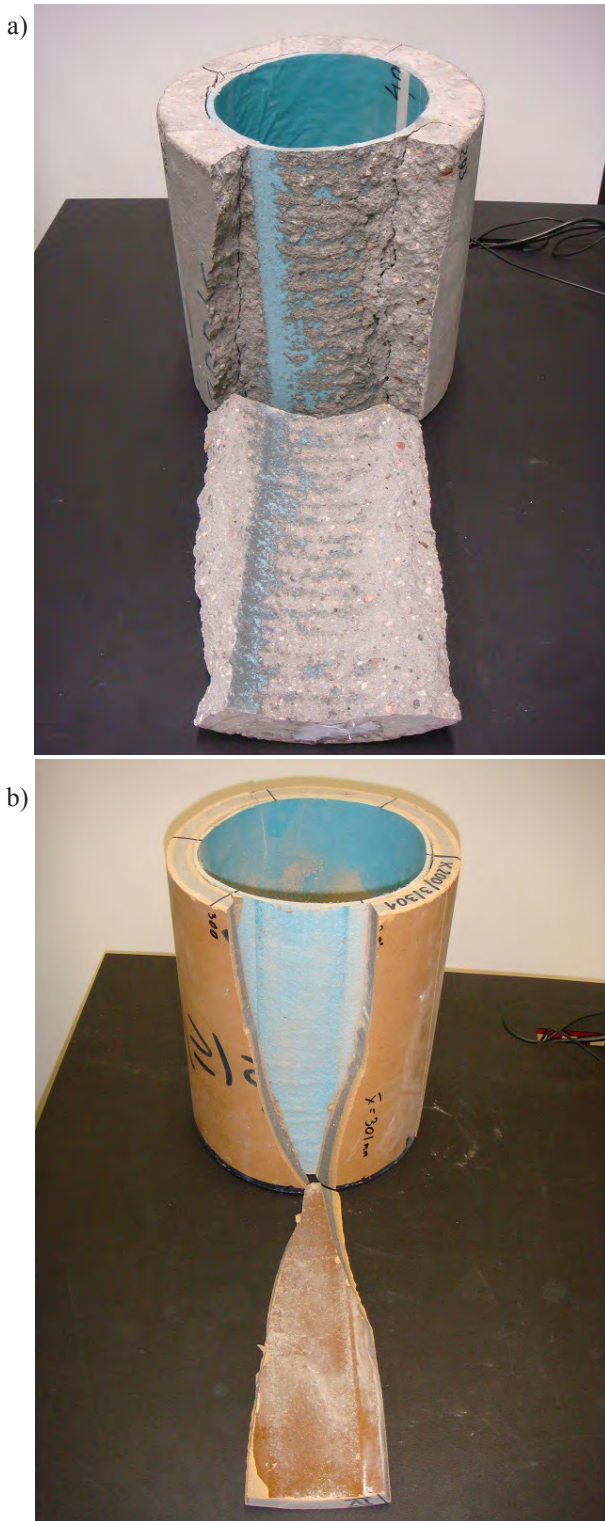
Samples after the test: a) concrete pipe with liner and b) vitrified clay pipe with liner
